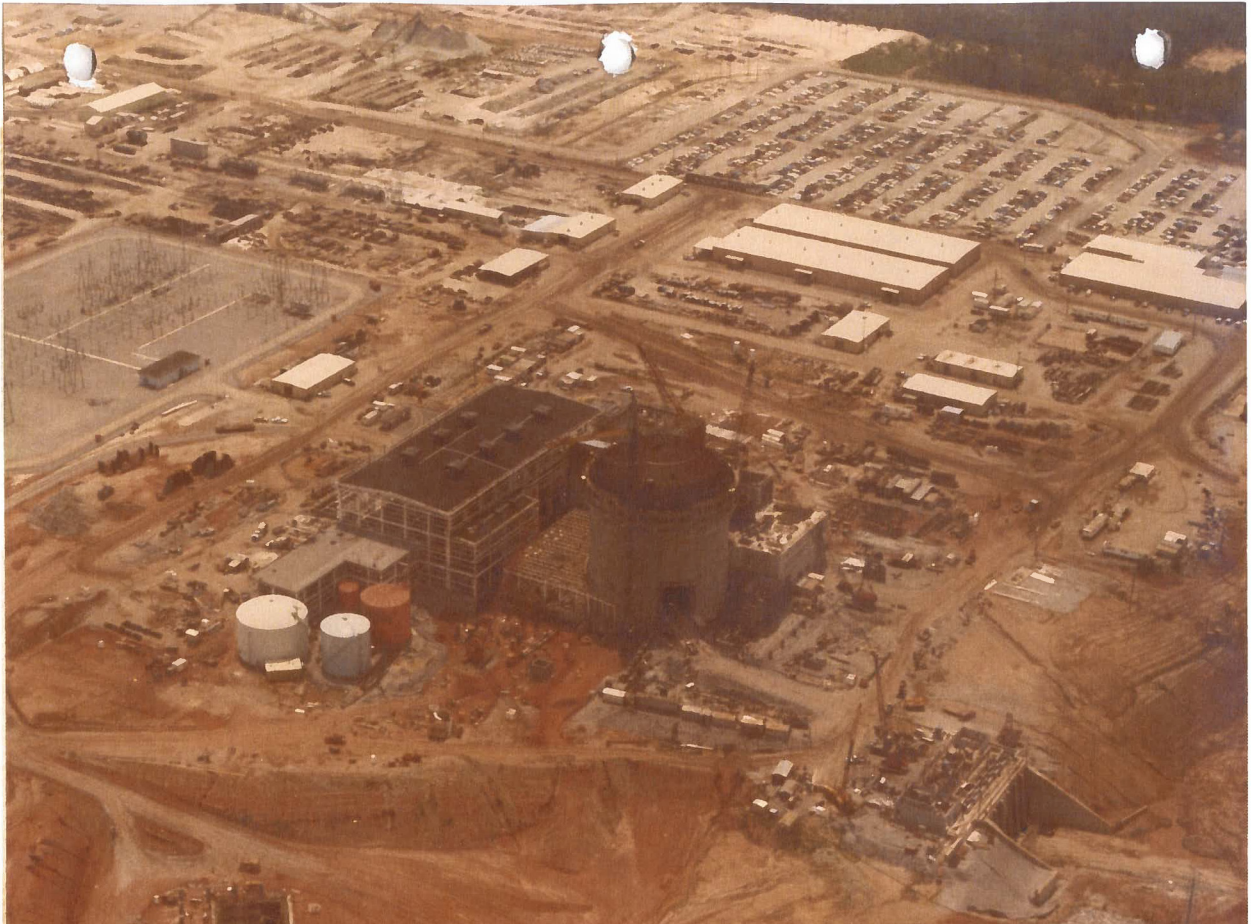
Late Construction Photograph of VCSNS Showing the Pumped Storage Facility in the Foreground, and the Unit 1 and Associated Facilities in the Background, Facing Southeast, 1977
